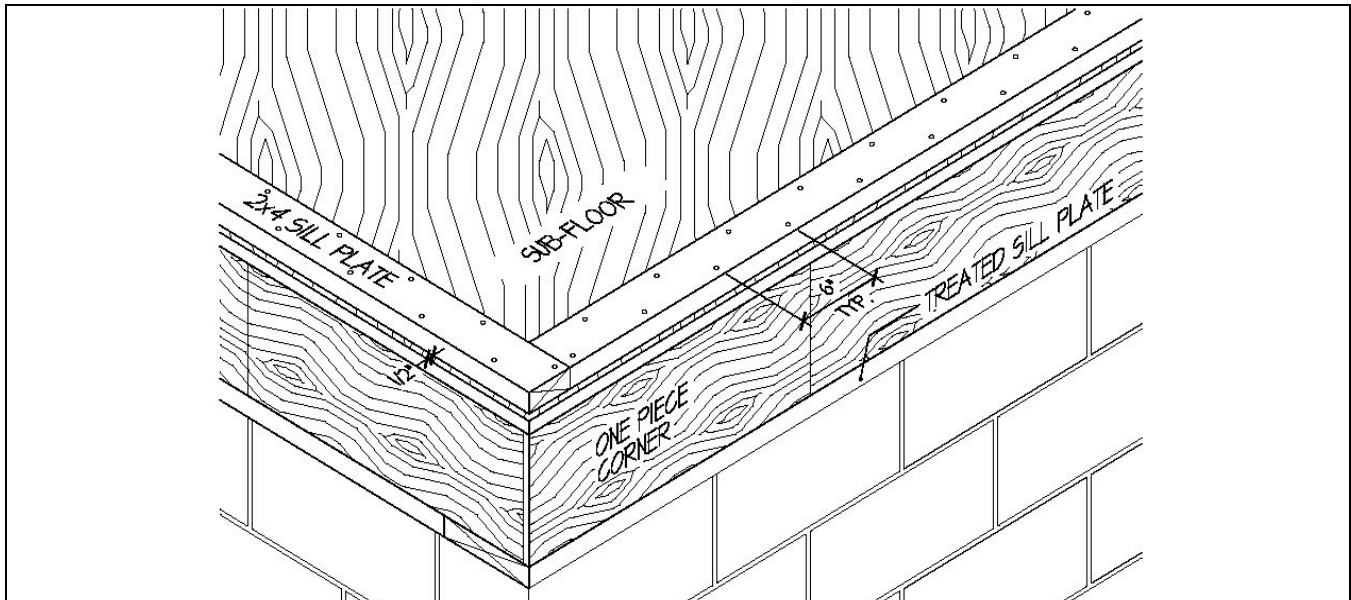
Securing Bottom Splines to Sill: 2" x 4" bottom splines are secured so that the wall panels will fit over them and be snug against the deck. Caulk underneath the bottom splines to ensure a tight seal.
